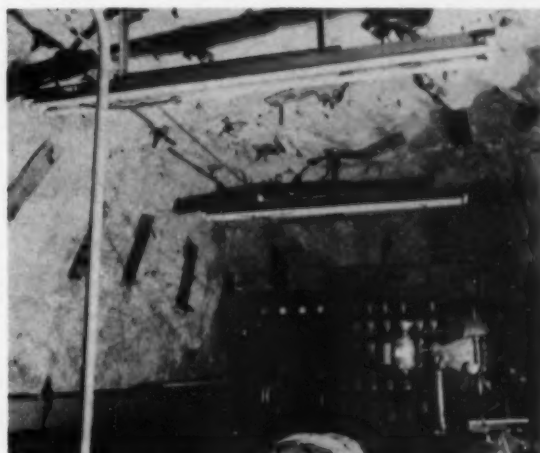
Rock bolt installation on 4000 level of Mt. Con mine housing electrical equipment for a deep level hoist.
